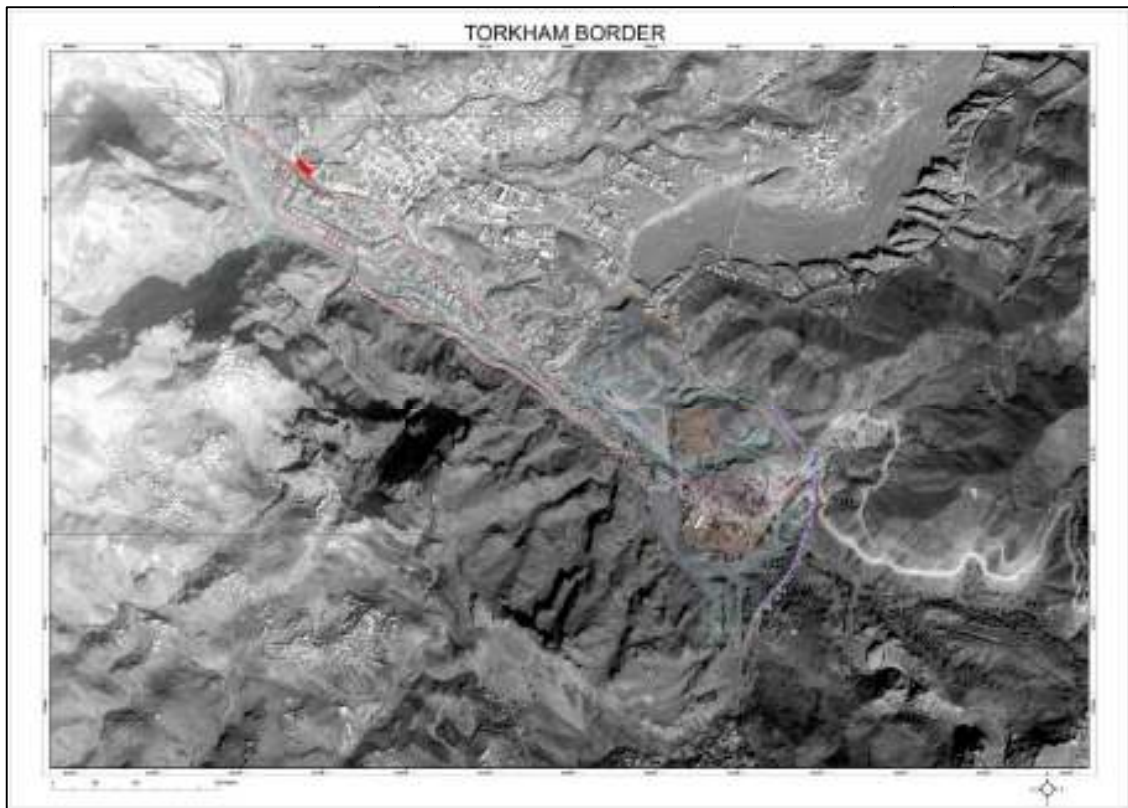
Layout of proposed Torkham Border Improvement Section
